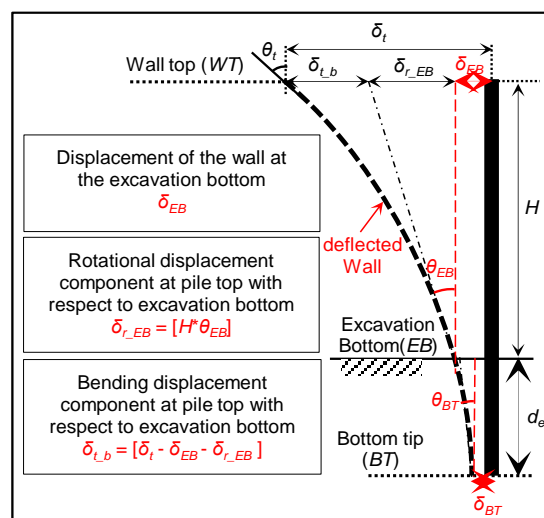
Typical deflection profile of cantilever type retaining wall
